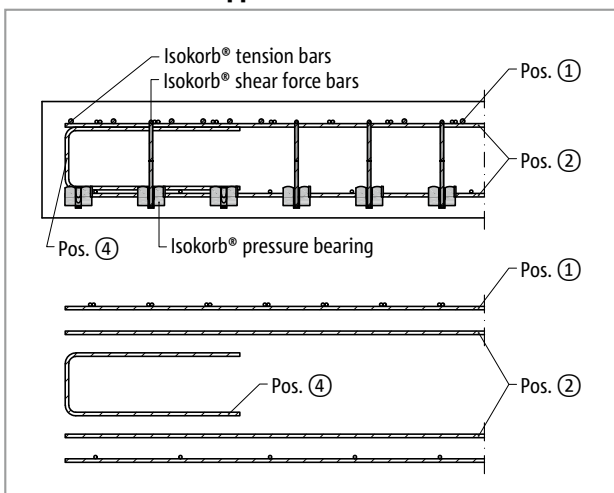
Schöck Isokorb® T type K-M1 to M11: On-site reinforcement on the balcony side in the Section A-A; Pos.4 = side reinforcement on the free edge perpendicular to the Schöck Isokorb®
